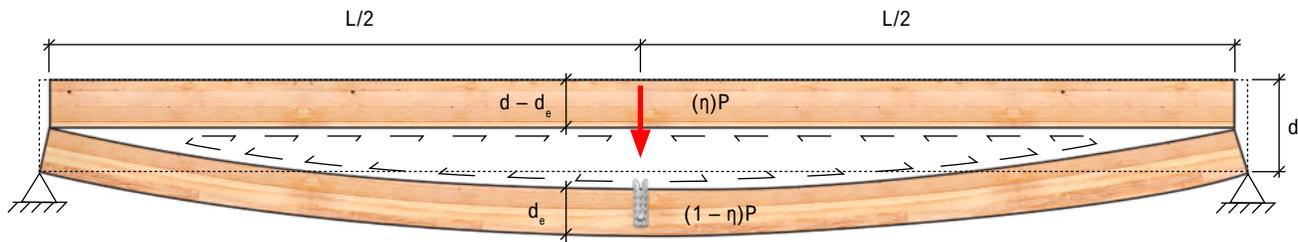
Beam Splitting with Hanger Installed at Mid-Span
